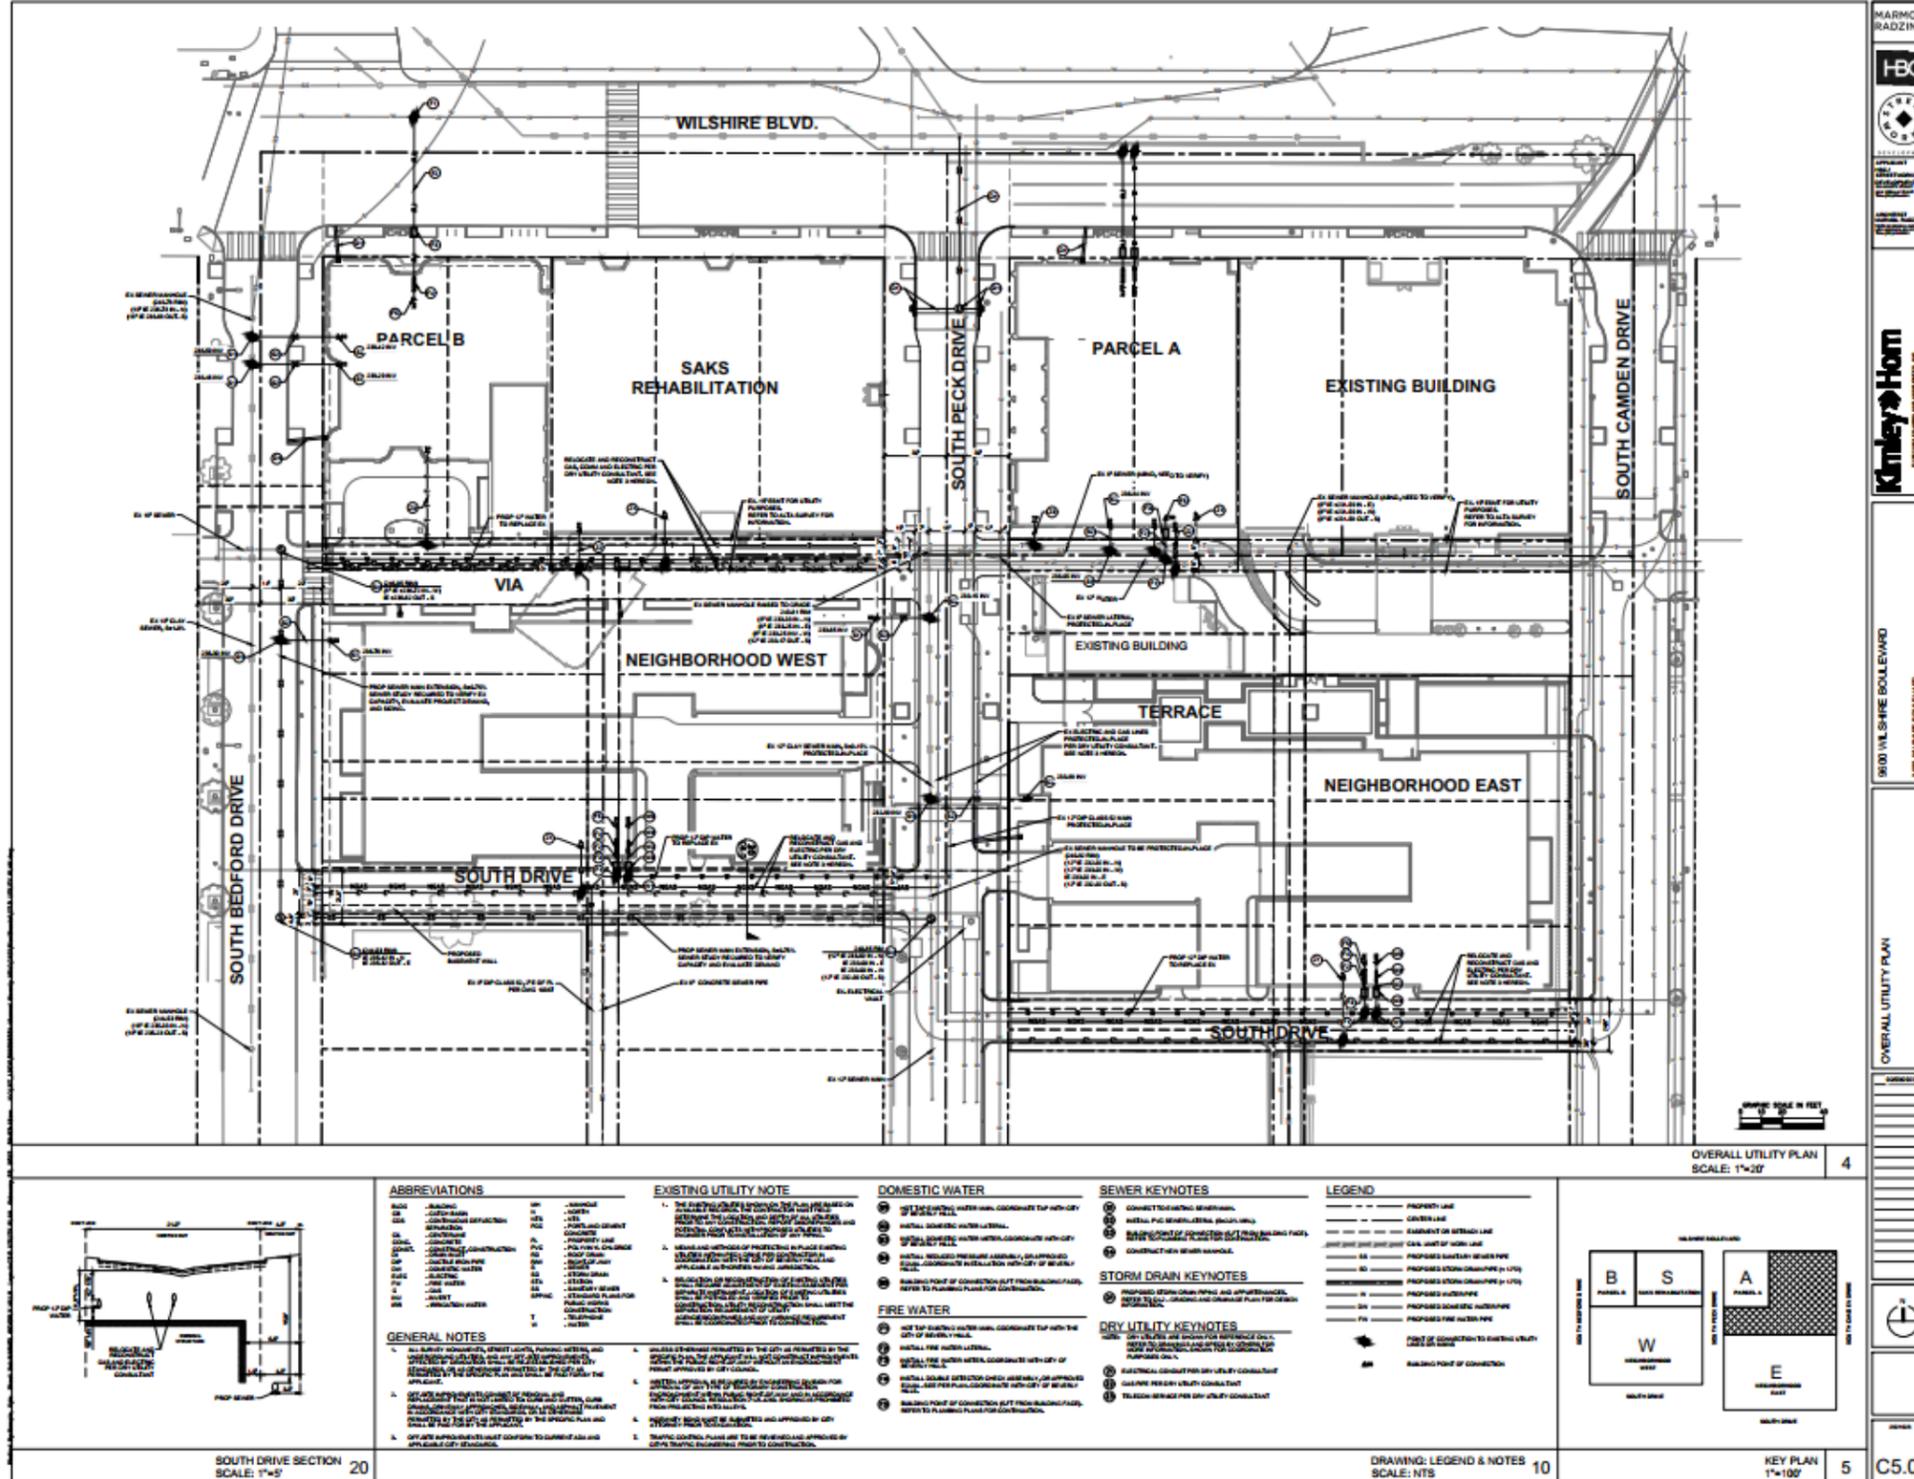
Conceptual Plan — Proposed Utilities Plan
